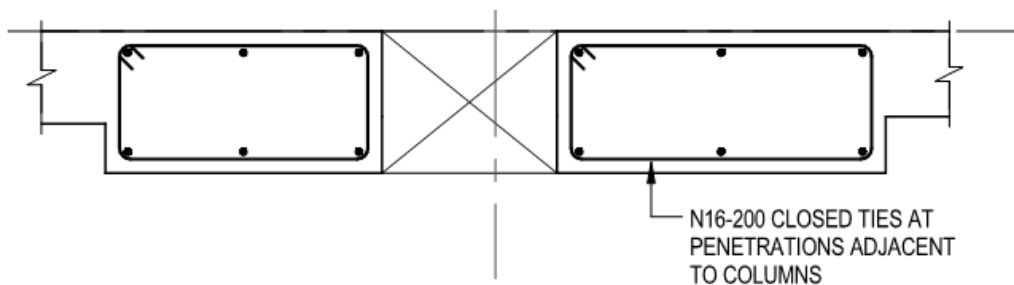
Typical internal beam detail with sacrificial topping.
